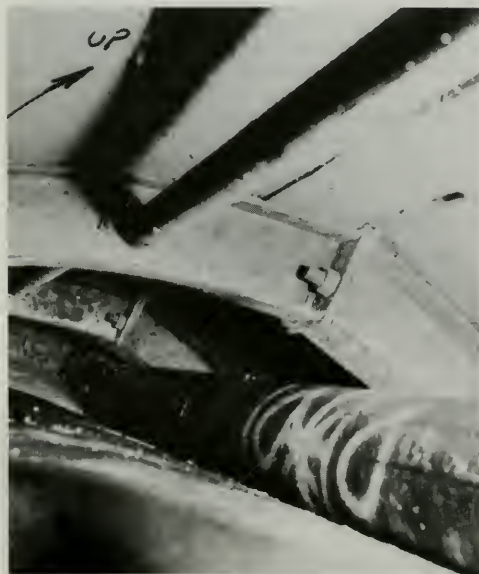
Slickline Behind the Tunnel Lining Form—Lo Costa Tunnel
